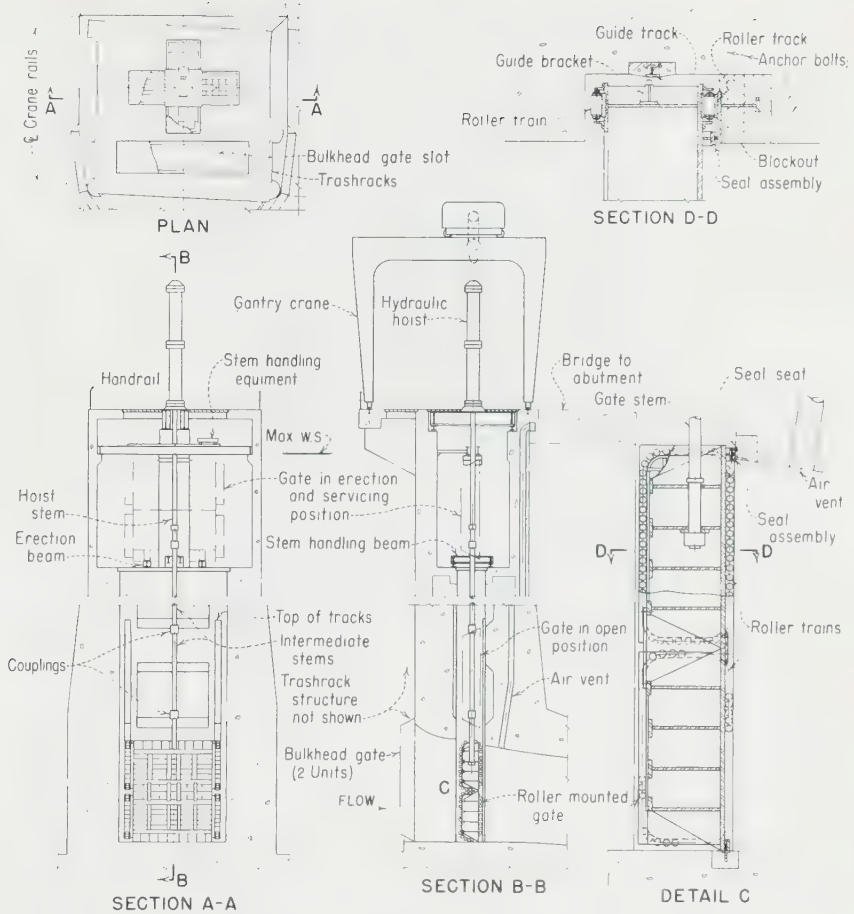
Typical installation of roller-mounted gate in a tower-type intake.
